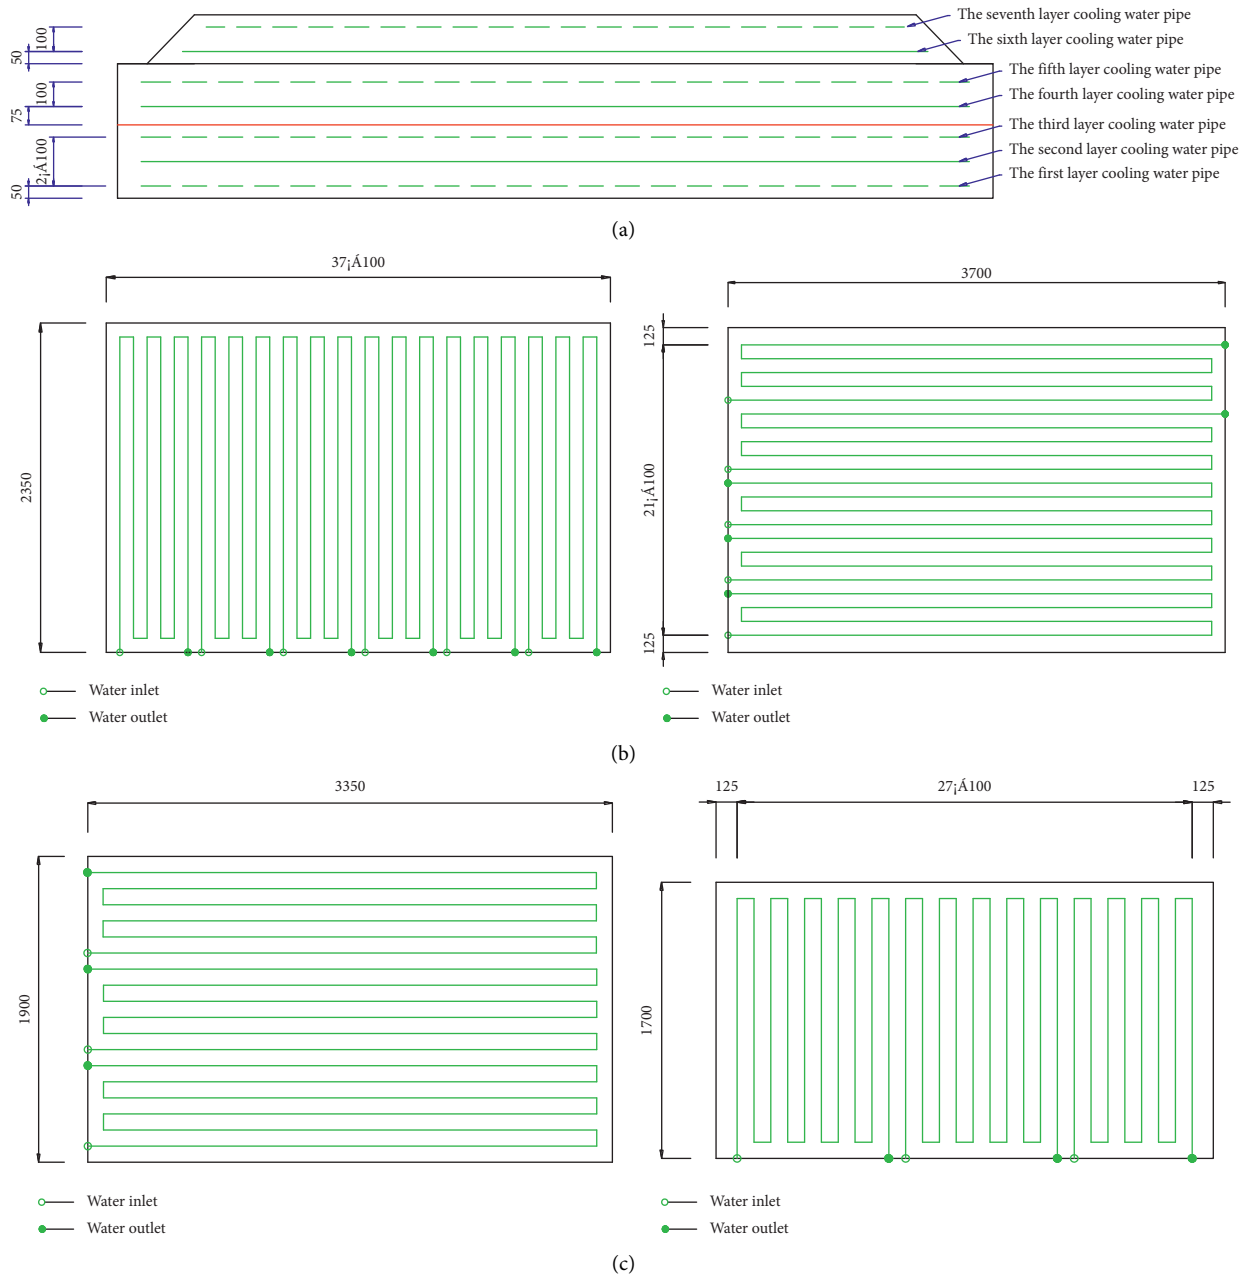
Cooling water pipe layout of cap and tower. (a) Elevation layout of cooling water pipes for cap and tower. (b) Cooling water pipe layout of cap. (c) Tower cooling water pipe layout.
